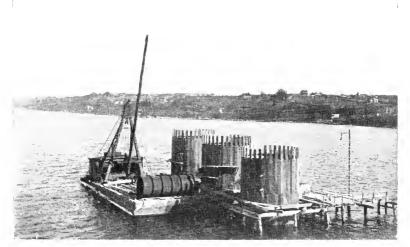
Caissons for Pier 4, Sunk to Rock Bottom.
